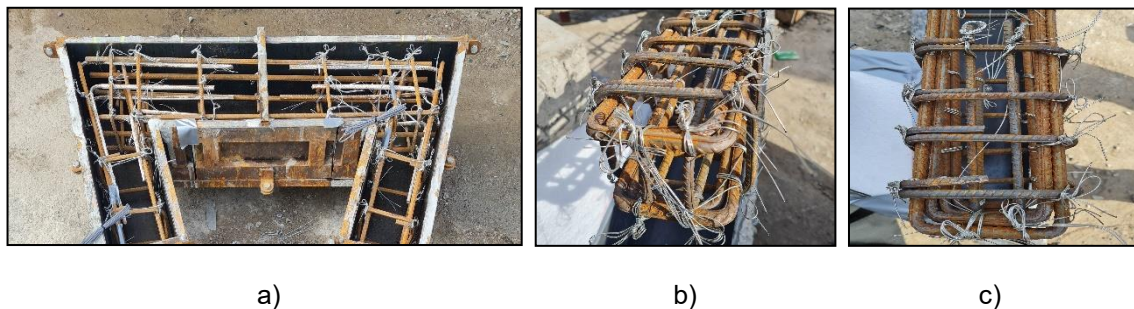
Additional steel bars in tip of column a) with tie beam, b) and c) without tie beam.
